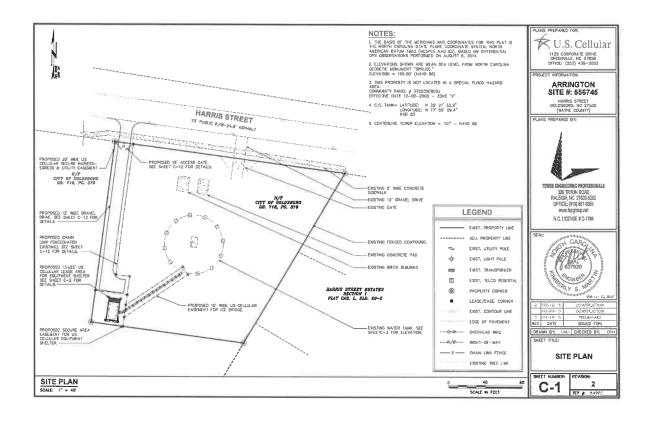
": SITE LAYOUT PLAN AND TOWER ELEVATION DRAWINGS
